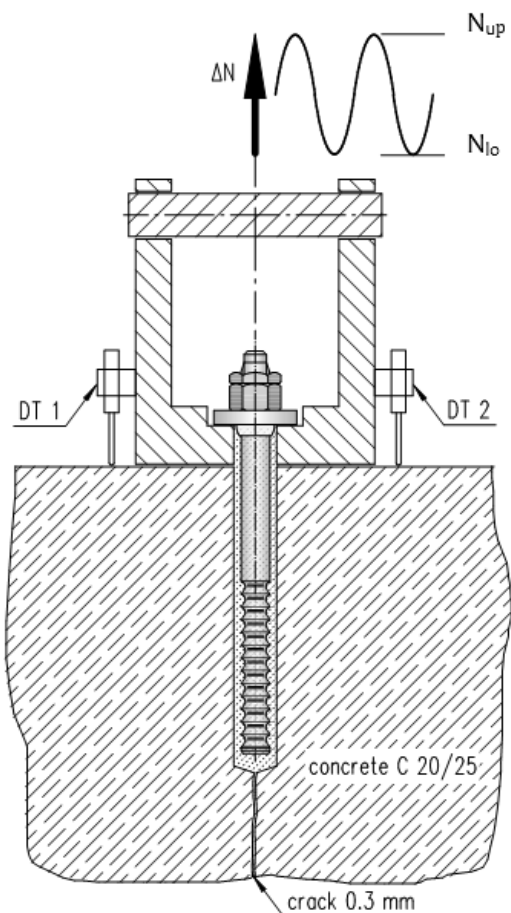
Example of test setup for steel failure under tension in cracked concrete with displacement transducer (DT)
